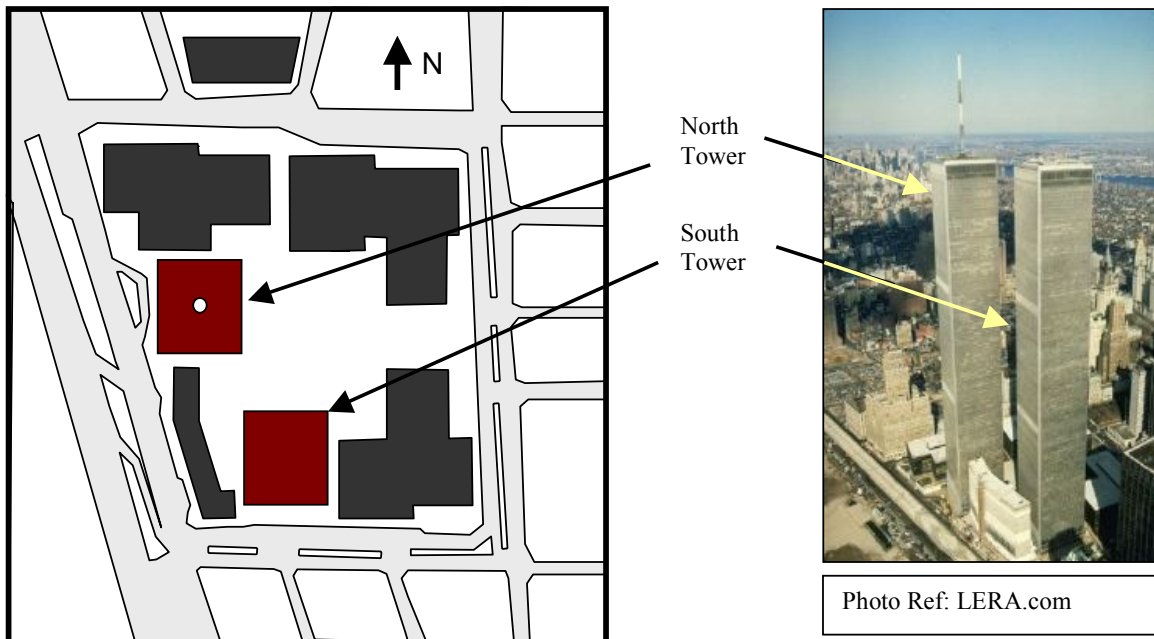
Plan View of the Site of the World Trade Center (Ref: Astaneh-Asl, 2002b)
